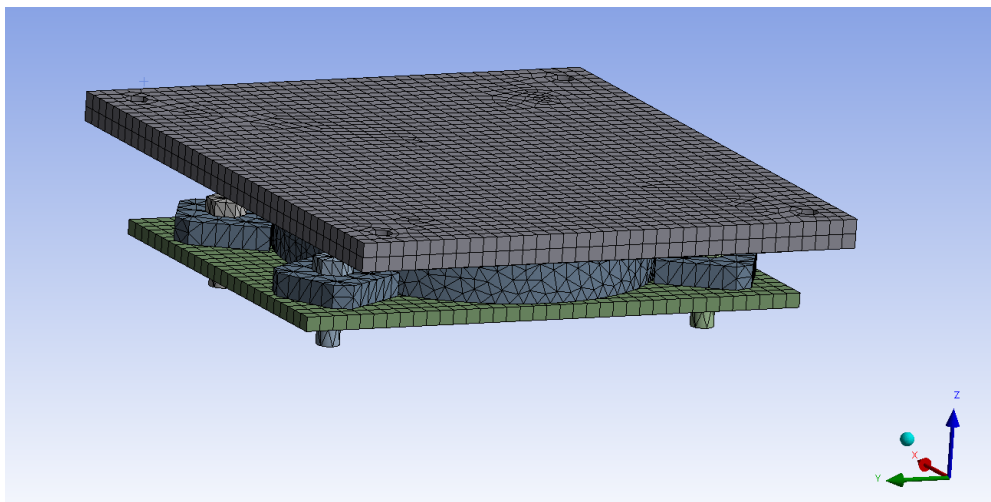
Assemble geometry of pot bearing in AutoCAD
